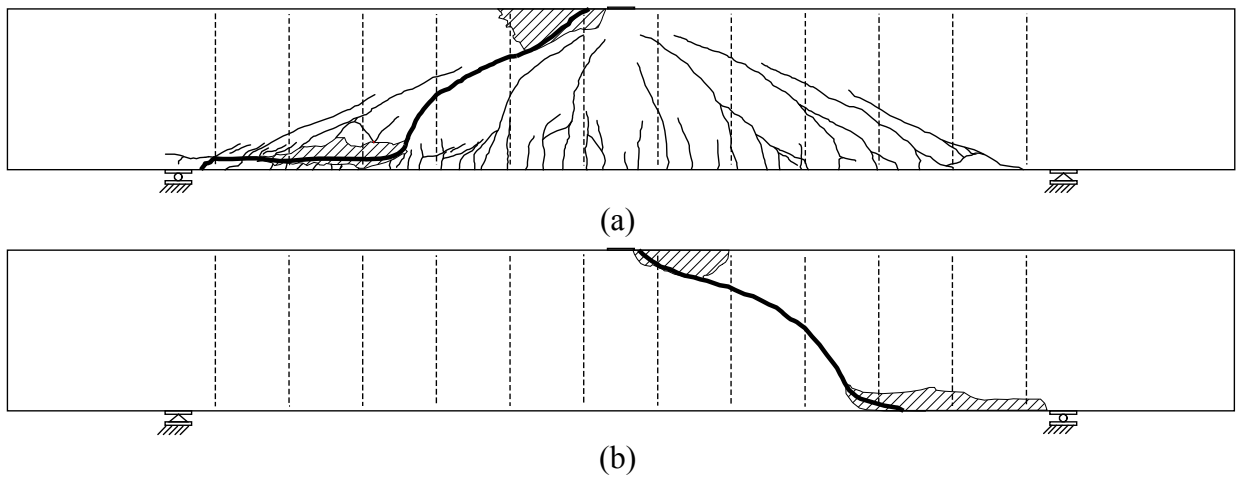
Observed damage in specimen P2S10, (a) front side, (b) back side
